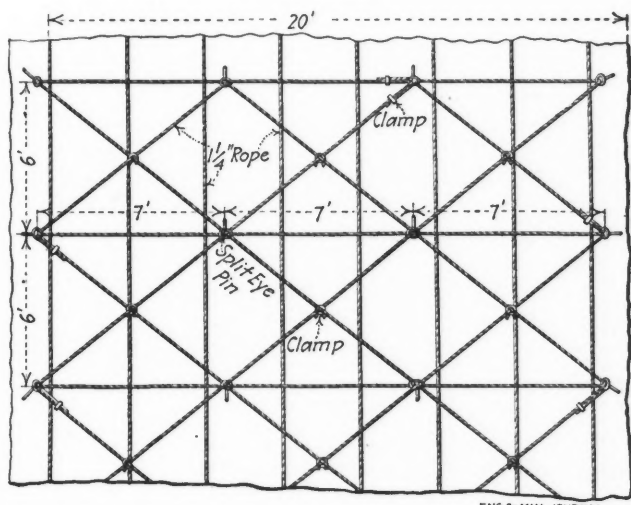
ROPE REINFORCEMENT IN CONCRETE HANGING WALL OF SHAFT
